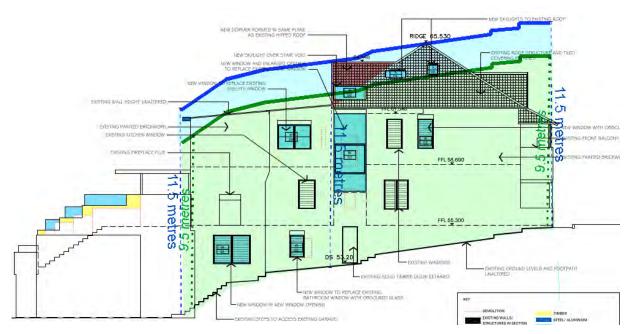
Diagram demonstrating Cl4.3 9.5m building height, and 11.5m existing height and proposed extension fitting within building envelope
